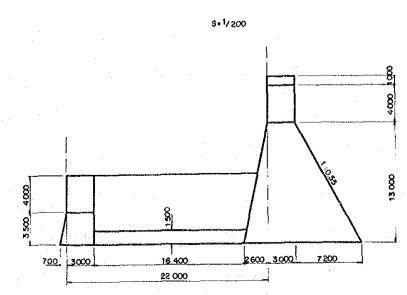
General Plan of Consolidation Dams in S. Cibanjaran
